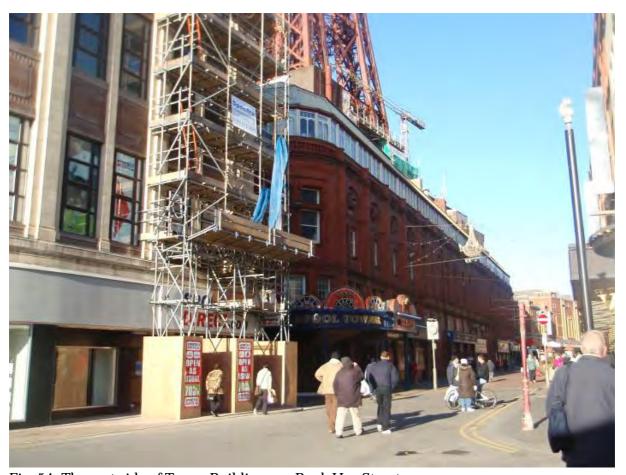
The east side of Tower Buildings on Bank Hey Street
